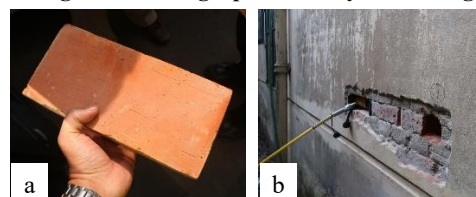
(a) Burnt clay brick and (b) Masonry infill wall in Bangladesh
